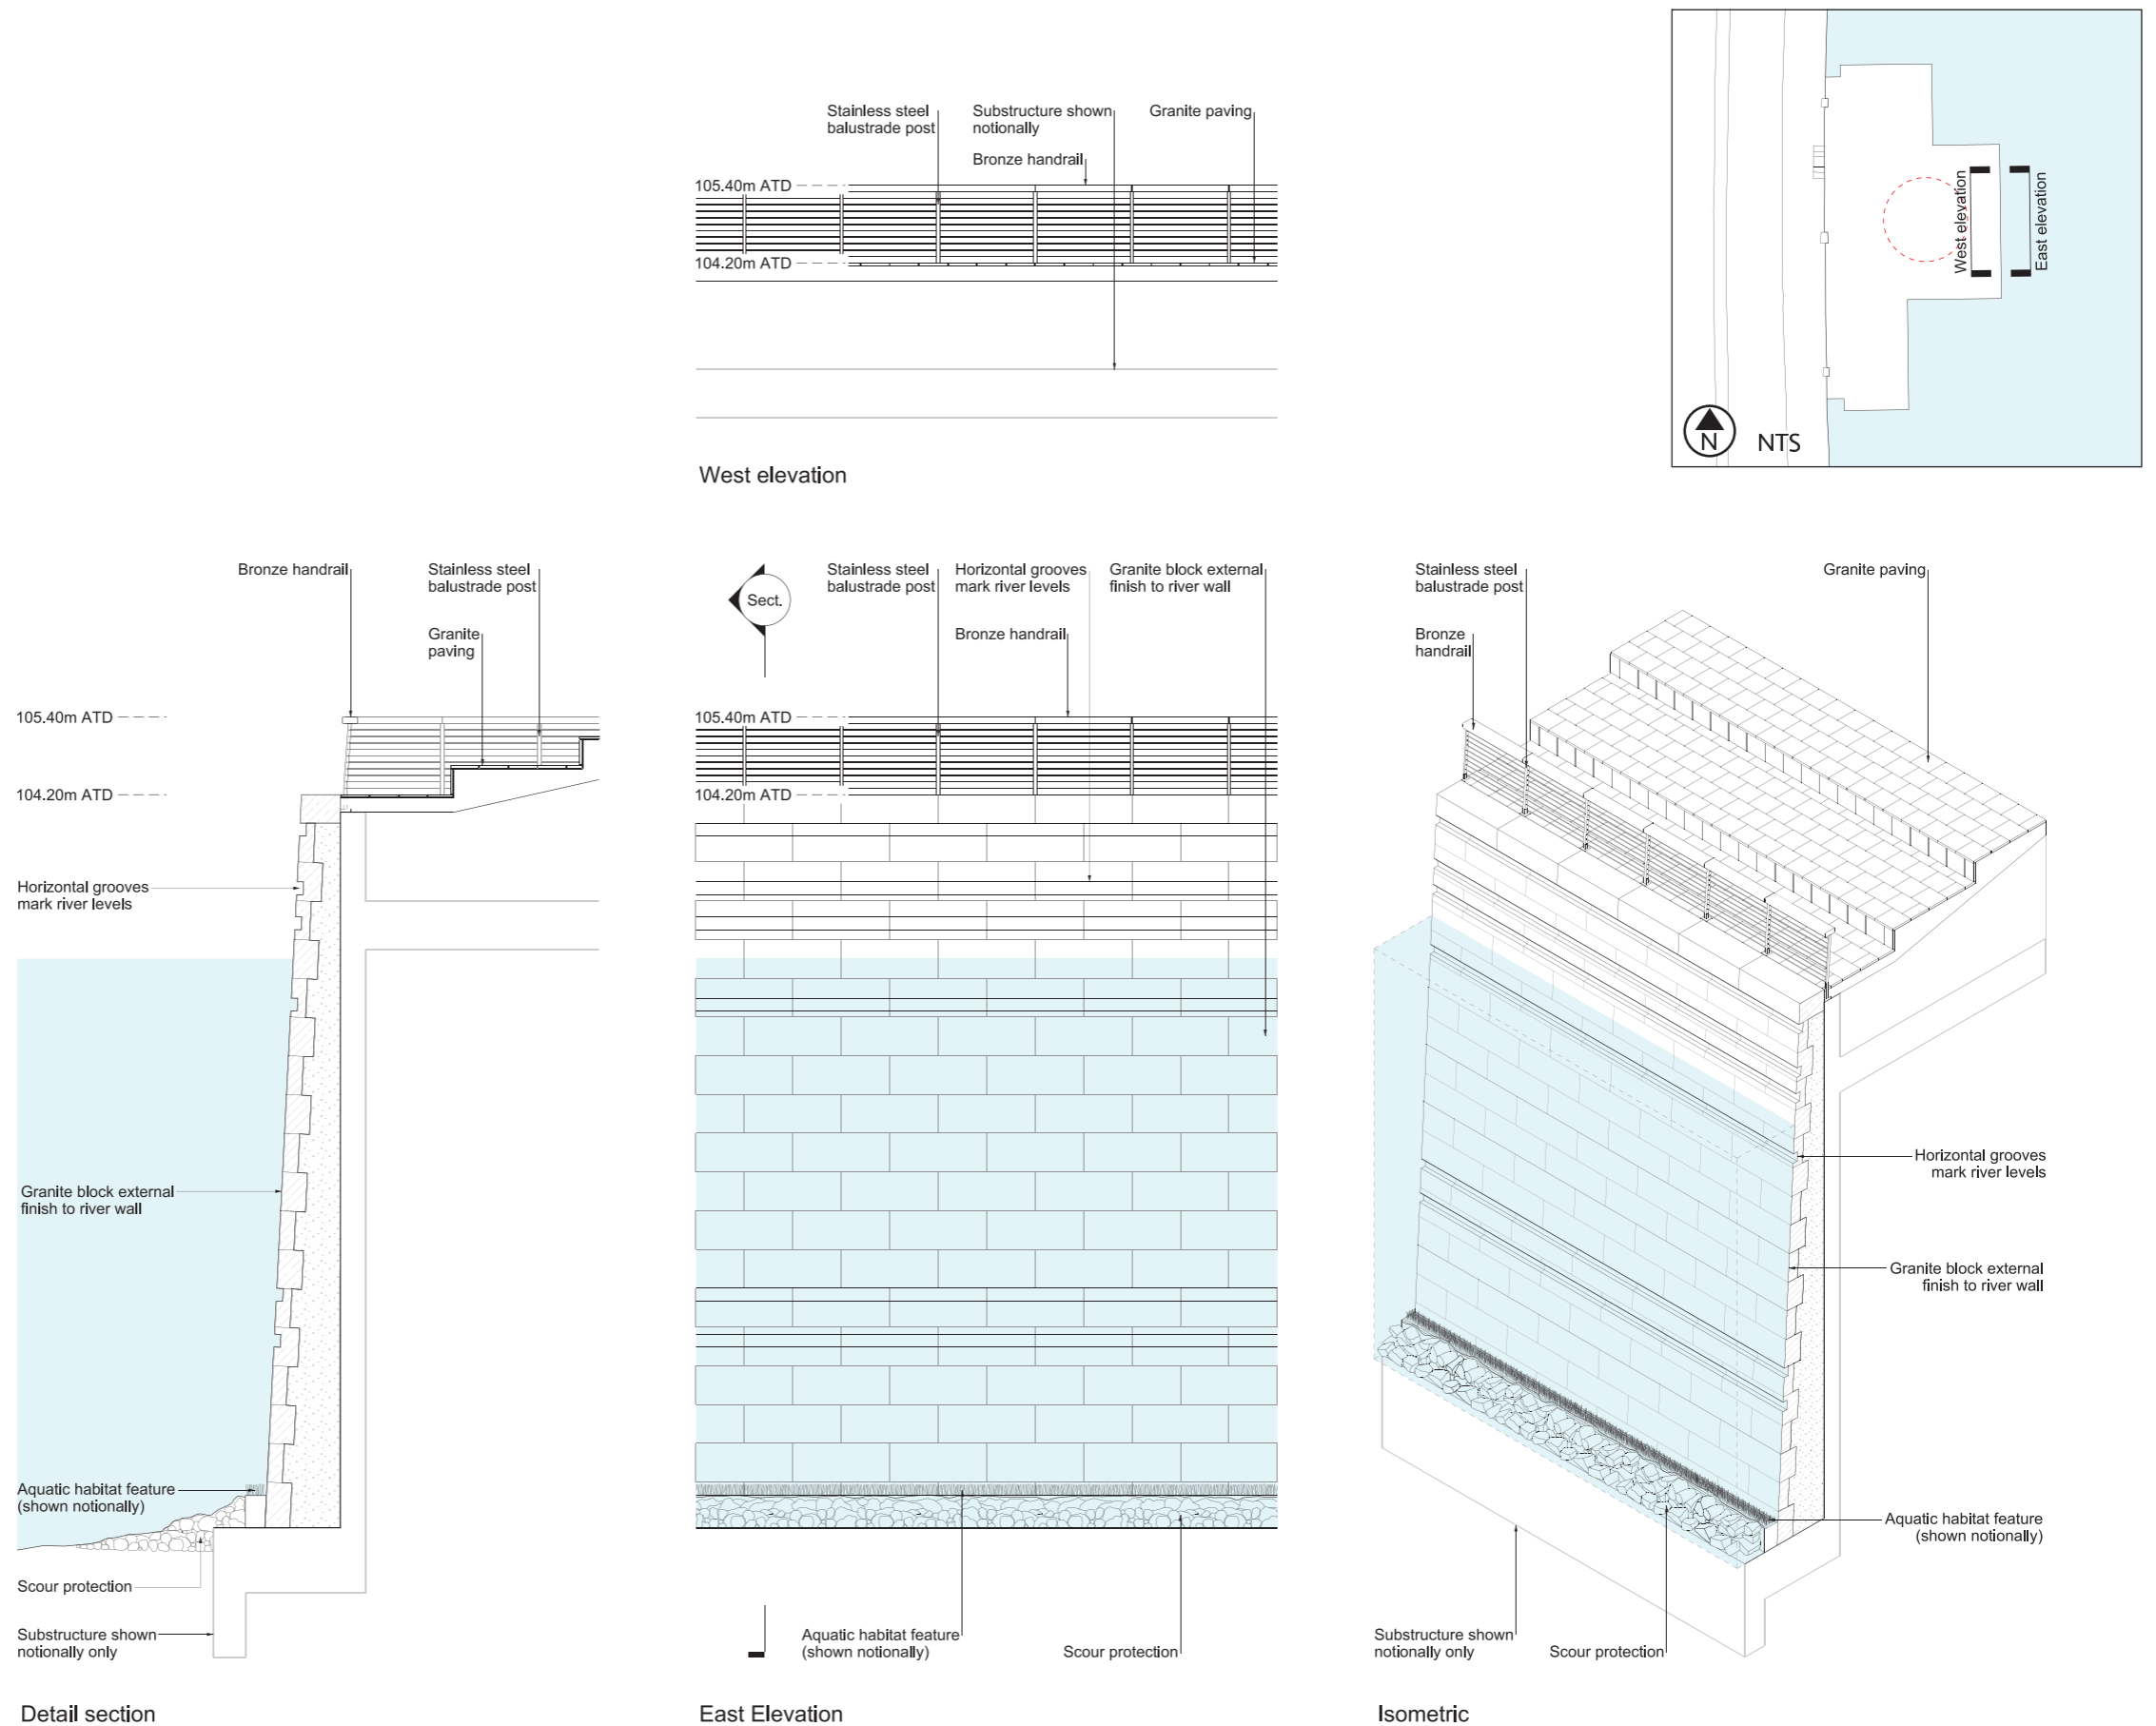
Proposed river wall (not to scale) - refer to Typical river wall design intent sheet 1 of 2 in the *Book of Plans
